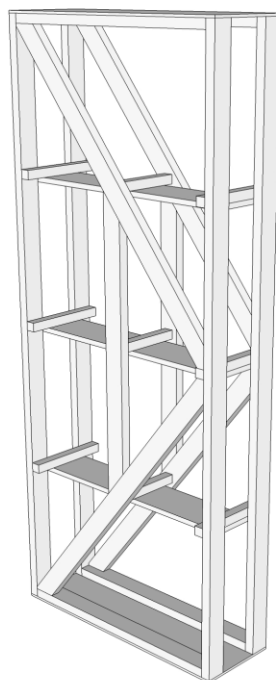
Wooden frame of panel T2 (with struts)
